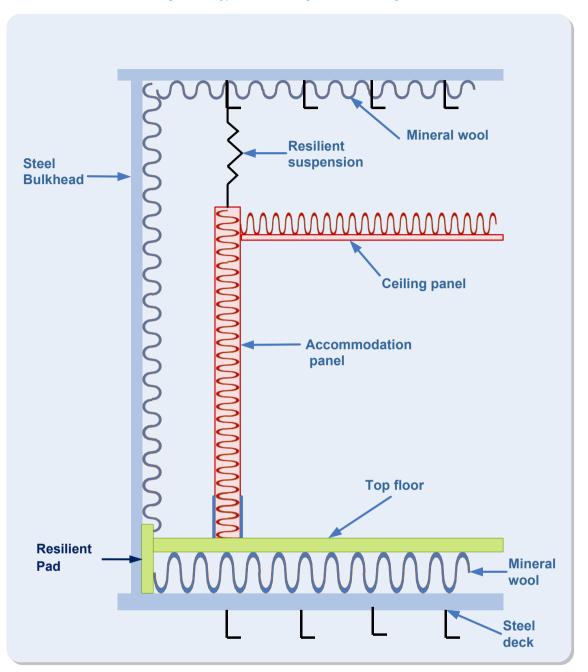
Typical LQ floating floor/wall/ceiling fit-out
